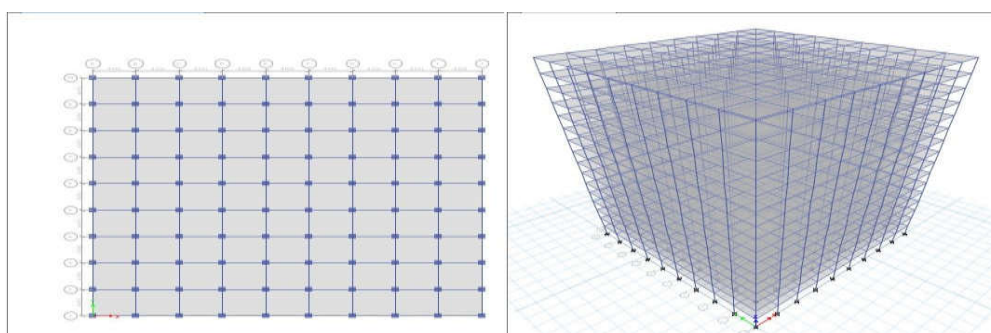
Assigning Beams, Columns, Slab to Regular Shape Building
